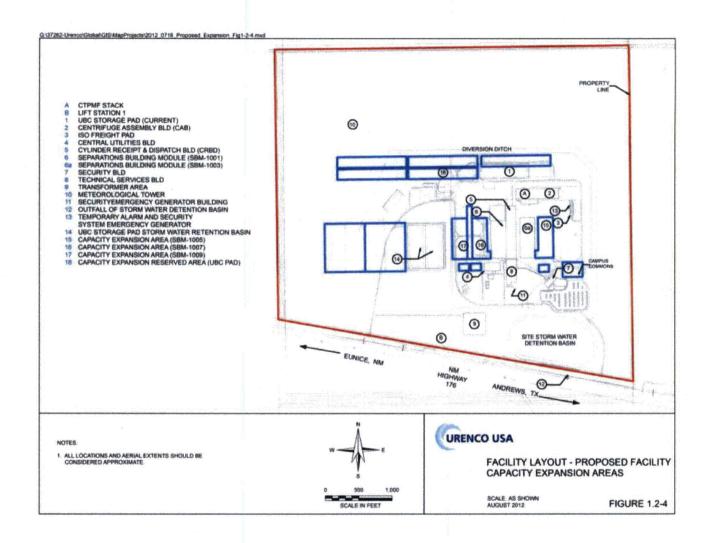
Facility Layout – Proposed Facility Capacity Expansion Areas
